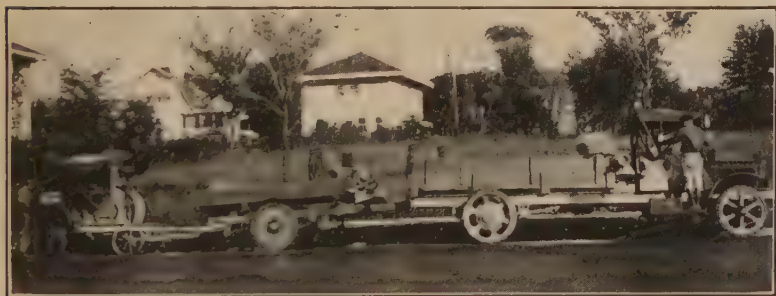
Truck, trailer, and concrete mixer for mixing and pouring concrete bases.
